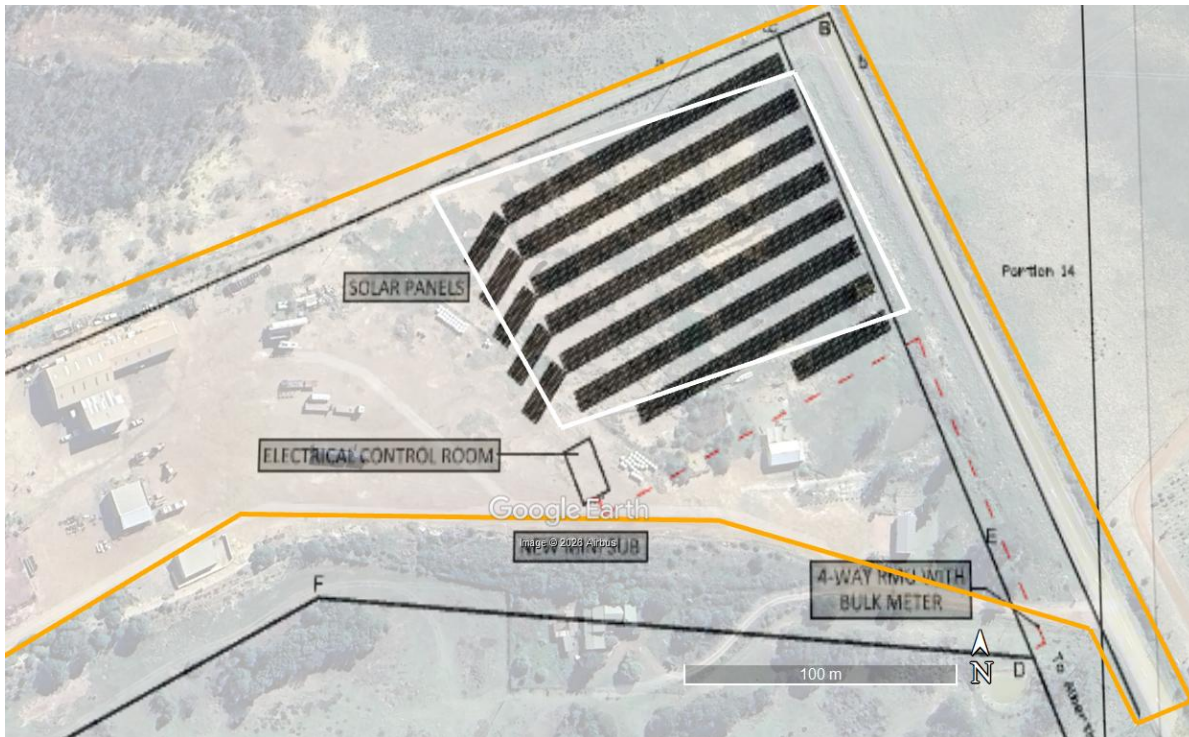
Layout of solar facility (adapted from Pro-Plan, 2026)
